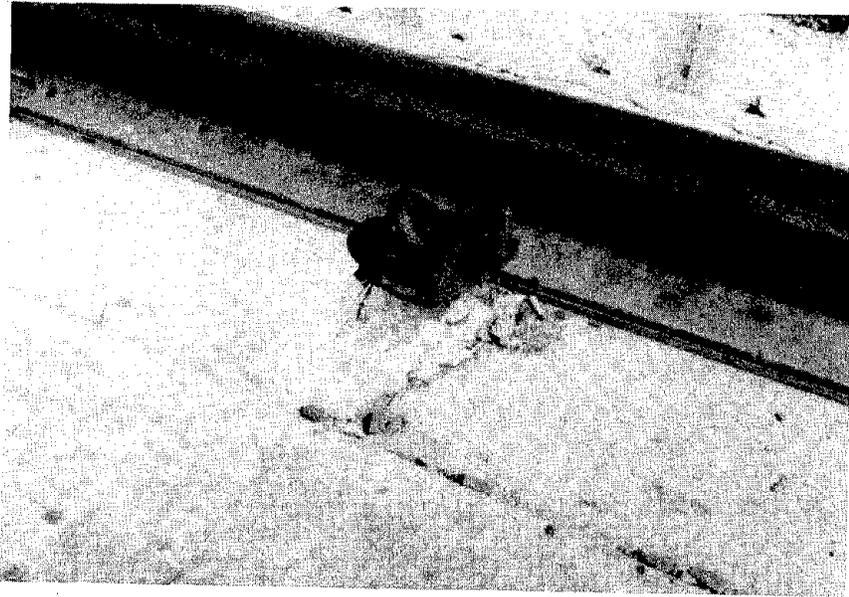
CONCRETE SPALLING AT LOOSENEED INSERTS
